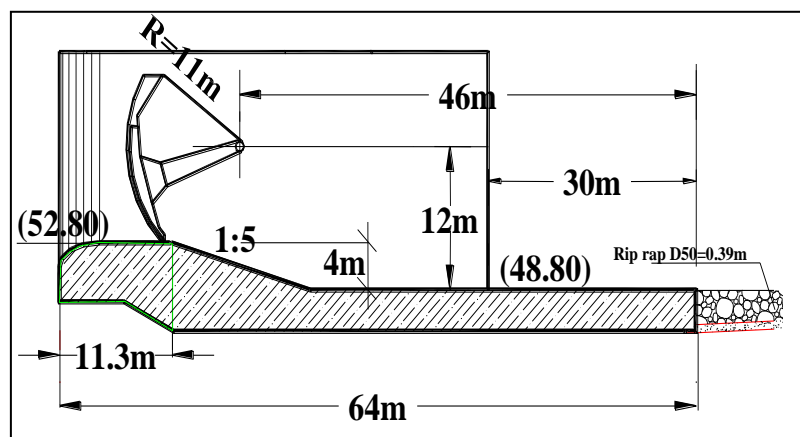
Longitudinal Section of the New Naga Hammadi Spillway Stilling Basin (HRI 1998)
